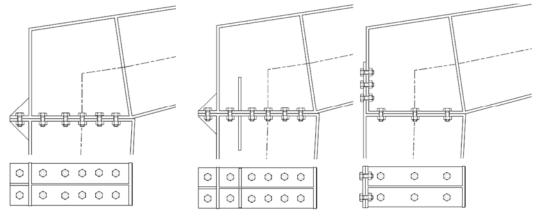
Connection typologies proposed in the PRECASTEEL [1] project for WT frames.
